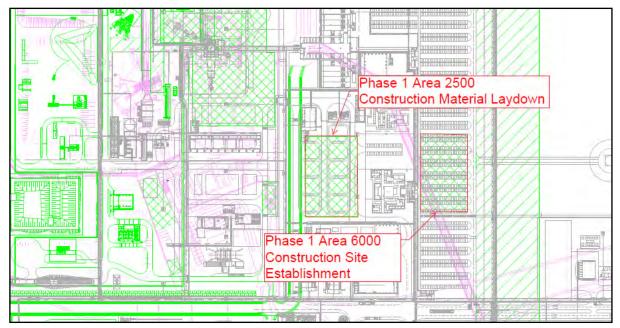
Phase 1 Material Laydown and Area 6000 Site Establishment
